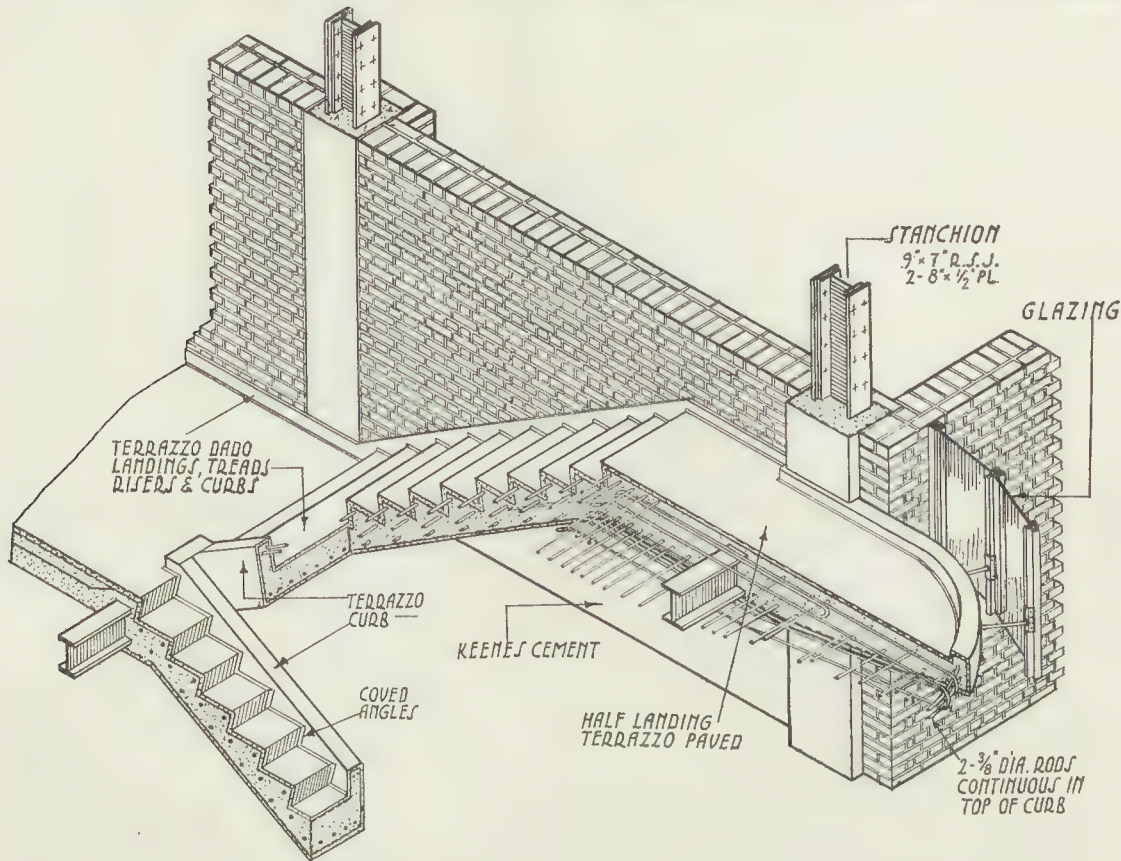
CONSTRUCTION OF STAIRWAY AND CANTILEVERED LANDING
